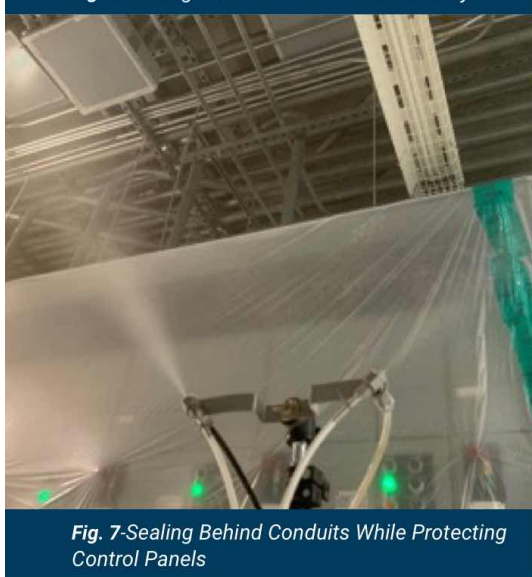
Sealing Behind Conduits While Protecting Control Panels
